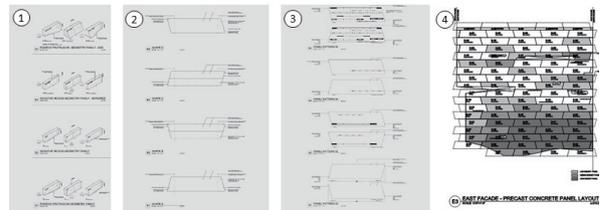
Precast module development from ① family, ② shape, ③ panel and ④ facade (Source: Gate Precast Company)
